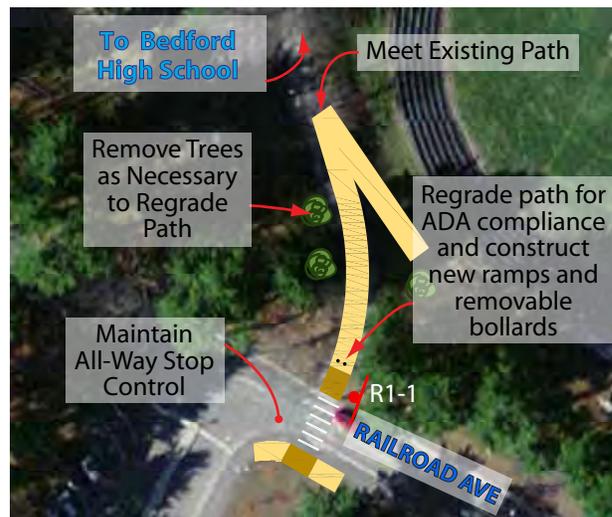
Construct Sidewalk Connection Between High School and Middle School
